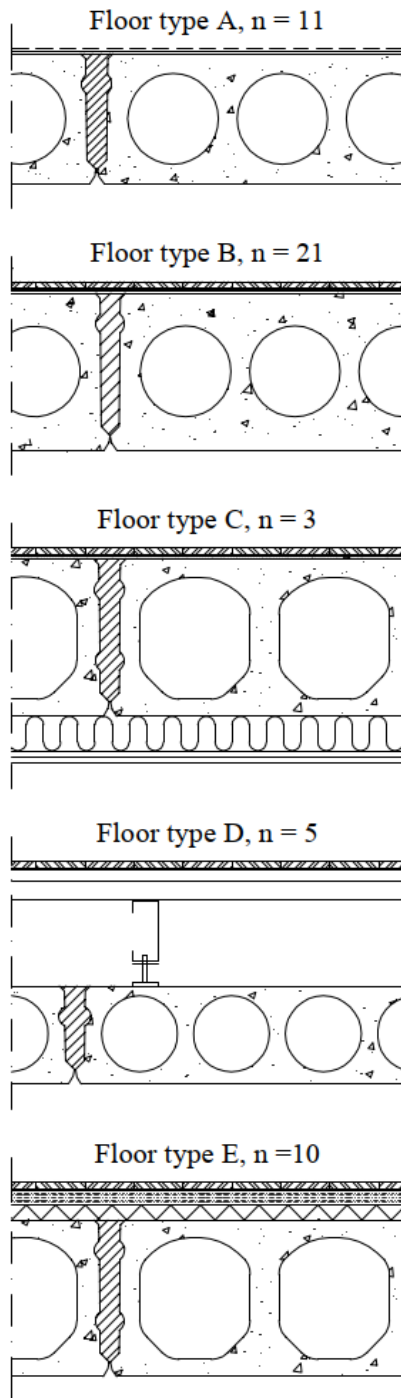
The studied floors were categorized in five groups. The bearing structures of the floors were either hollow core slabs as shown here or cast concrete slabs.
